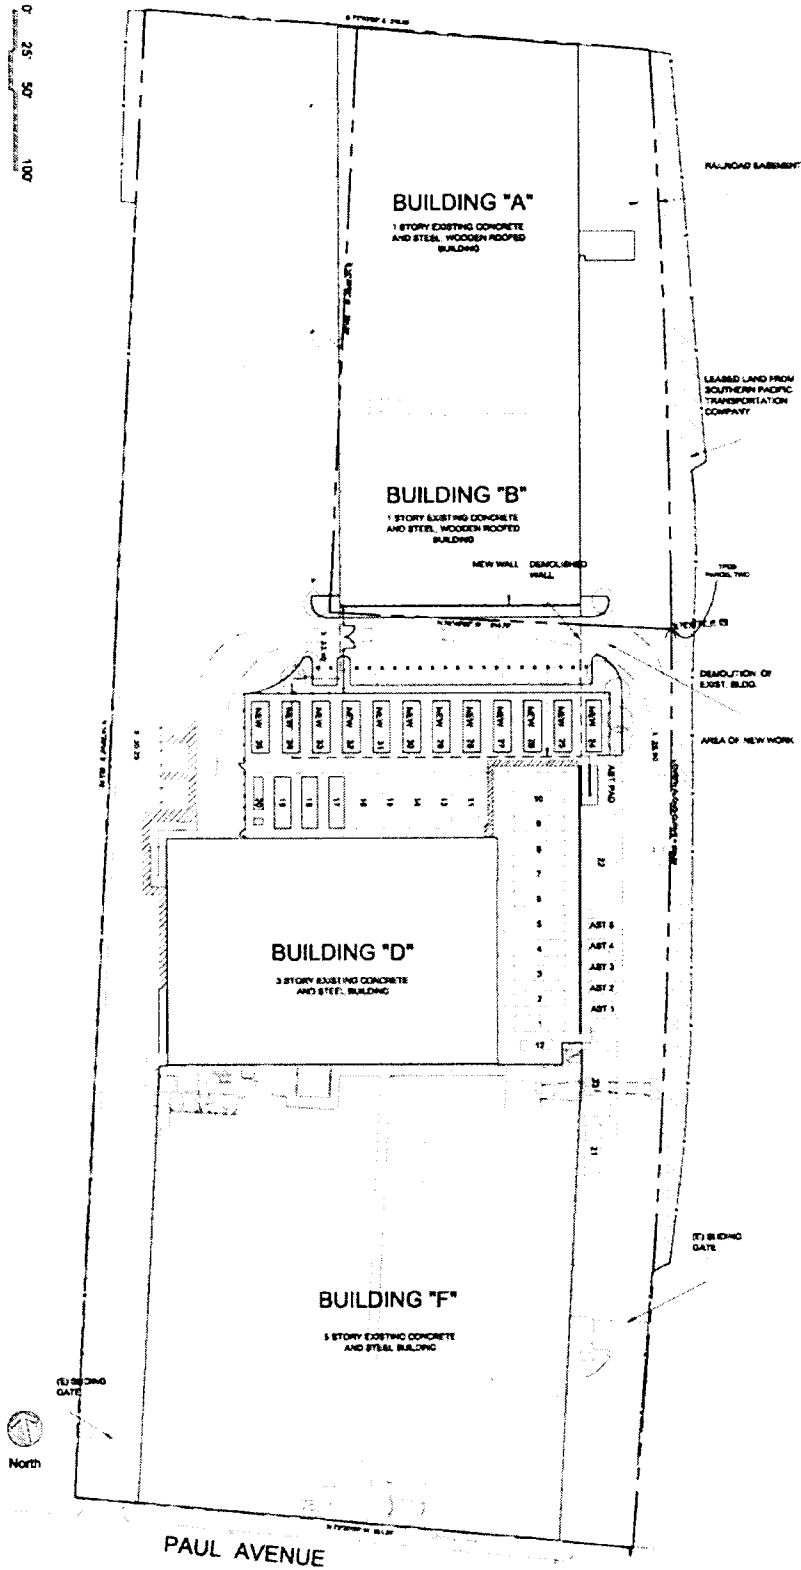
Site Plan Showing Portion of Building B To Be Removed
